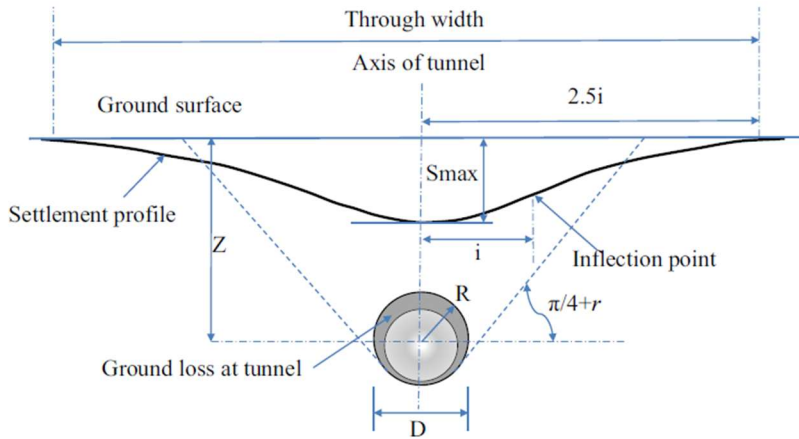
Typical Section of the Surface Settlement Induced by Tunnelling [27]
